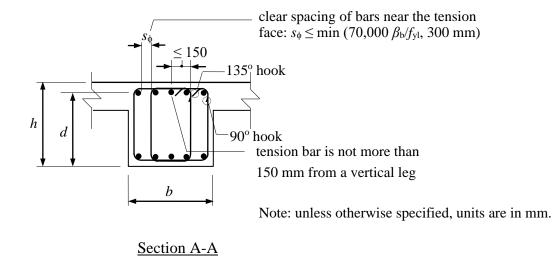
Reinforcement requirements for conventional RC frame beams
